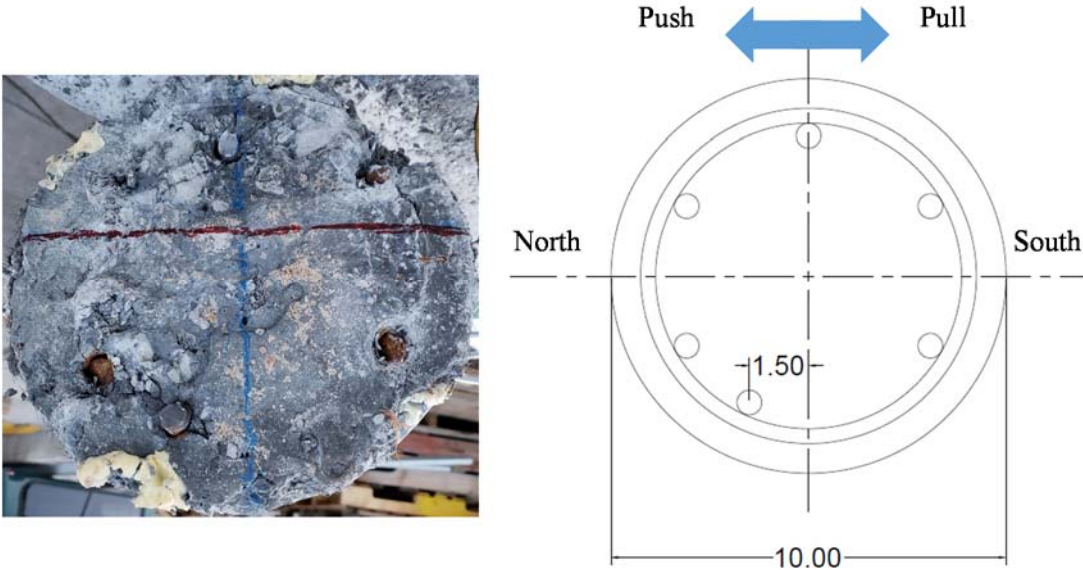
The as-built S1 UHPC column cross-section (full column was separated from the footing after testing).
